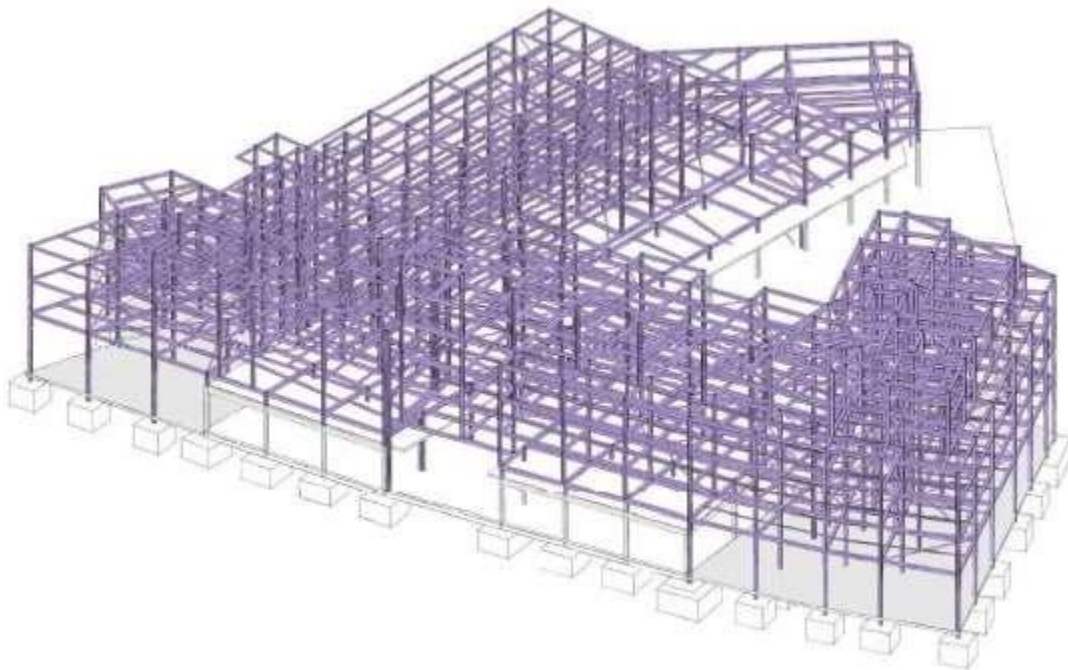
Image of the proposed Block C superstructure (coloured purple), with the existing building frame and foundations shown in black and white. The diagram shows the majority of the new frame oversailing the central section of the existing mall and coming to ground either side of it.
